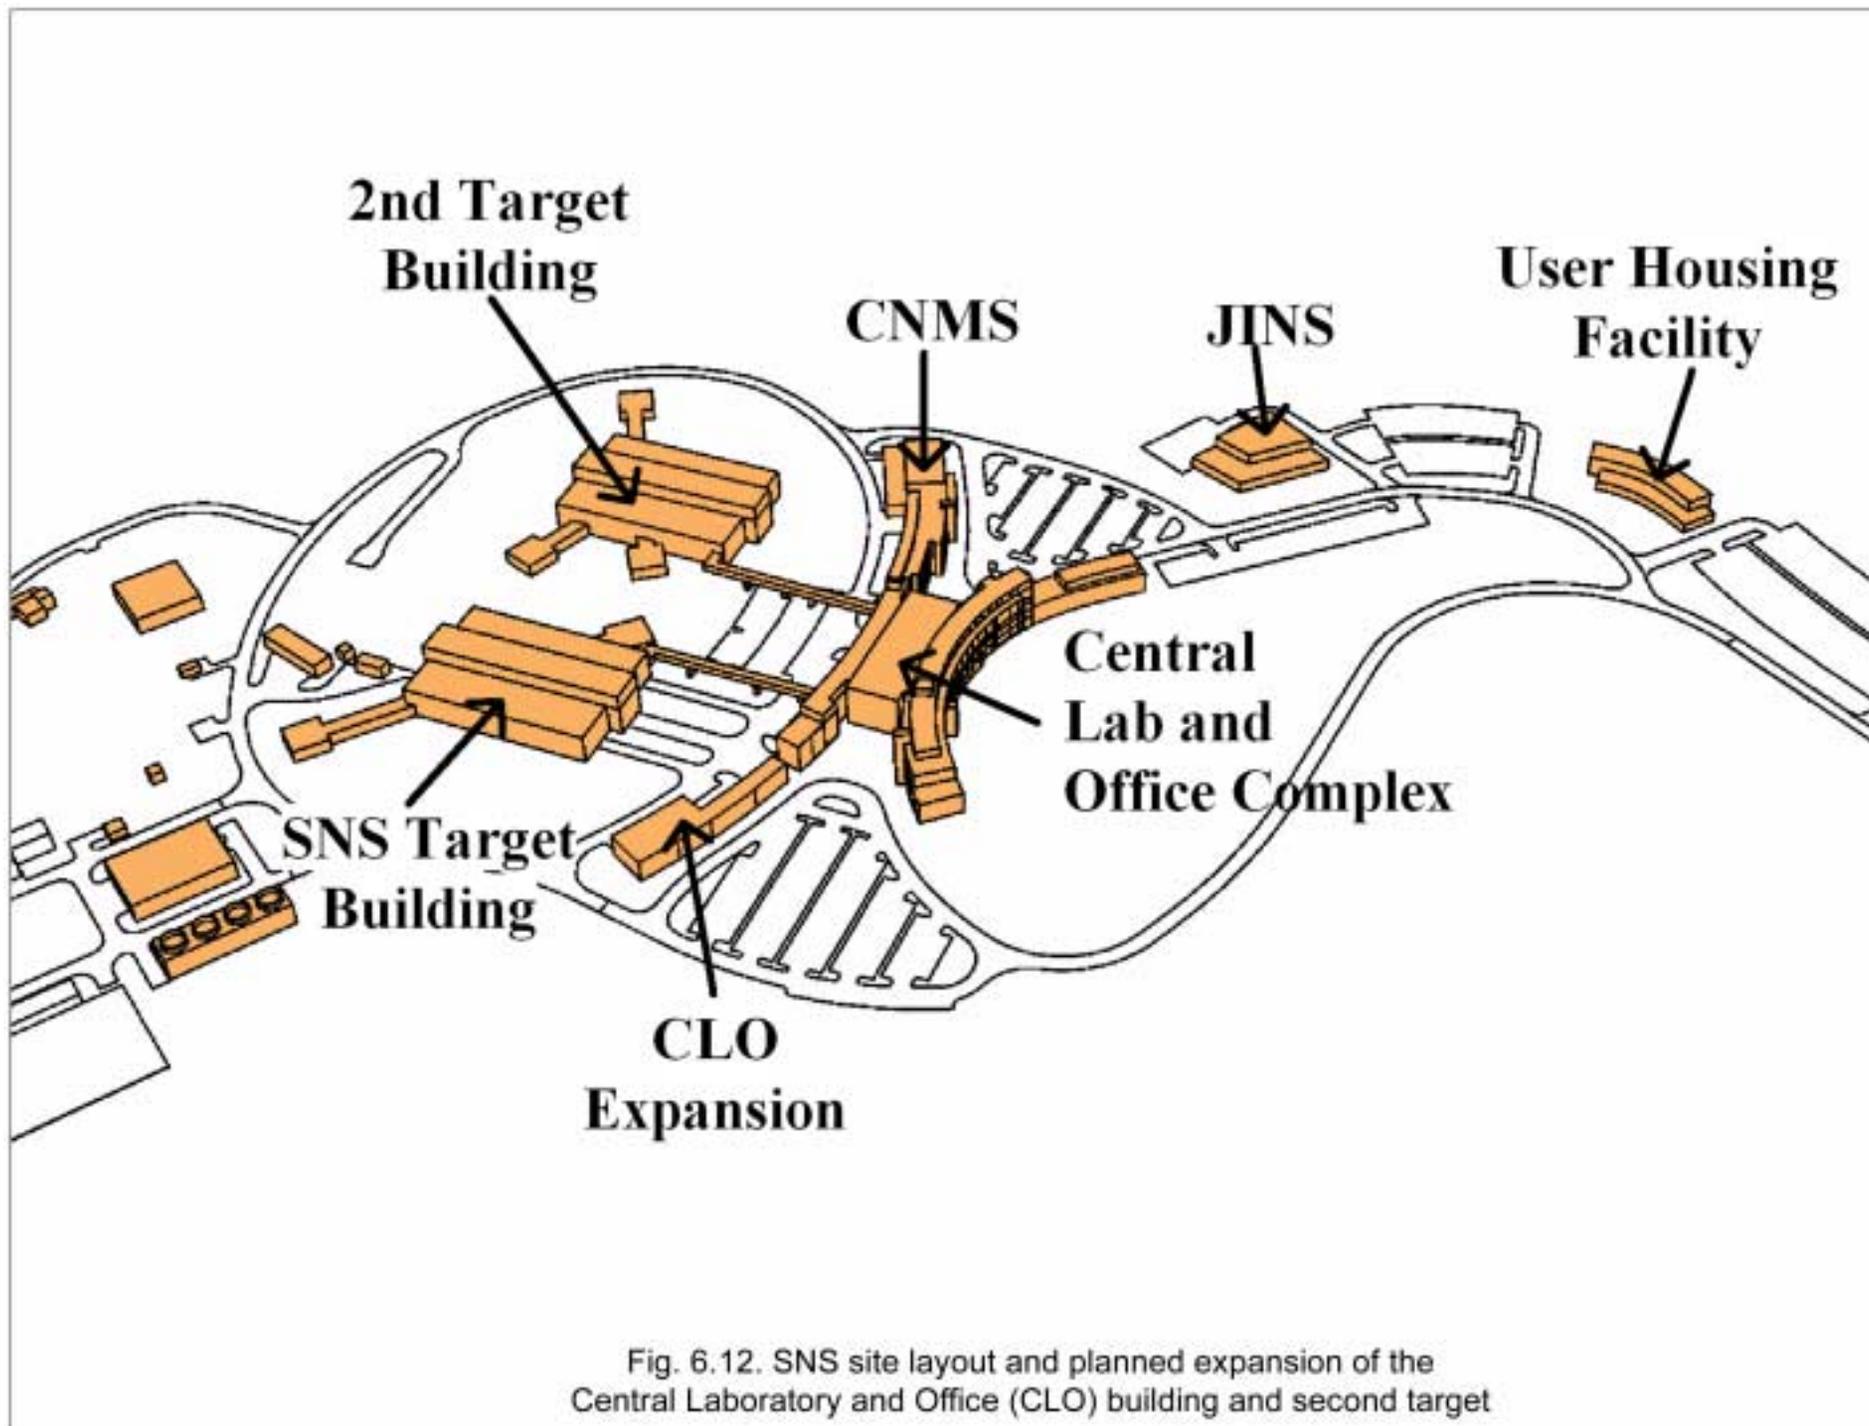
SNS site layout and planned expansion of the Central Laboratory and Office (CLO) building and second target
